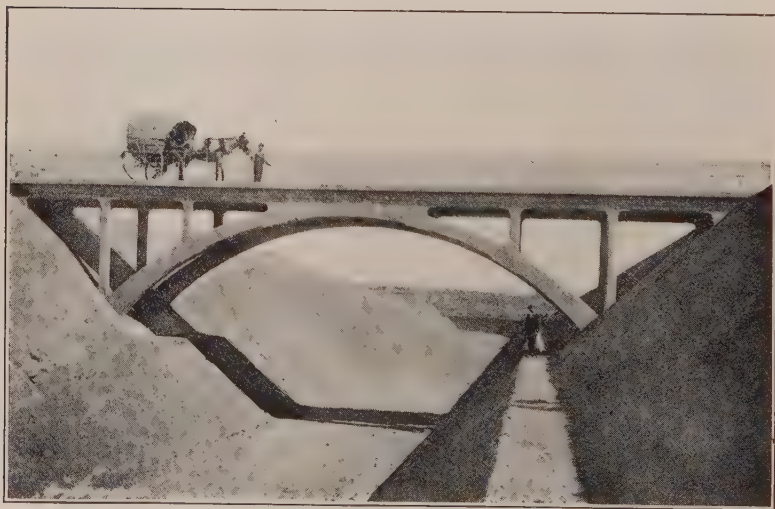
Reinforced-Concrete Bridge across the Canal de Zaidin.
